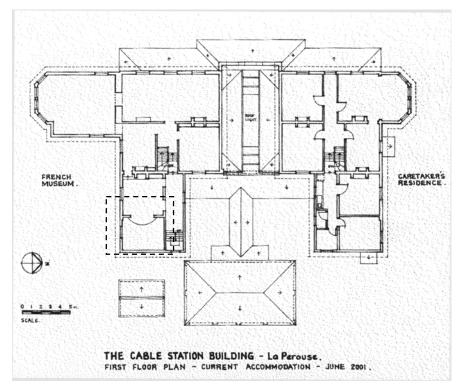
First floor plan of Cable Station building in 2001 (from Danis et al.: 167).
